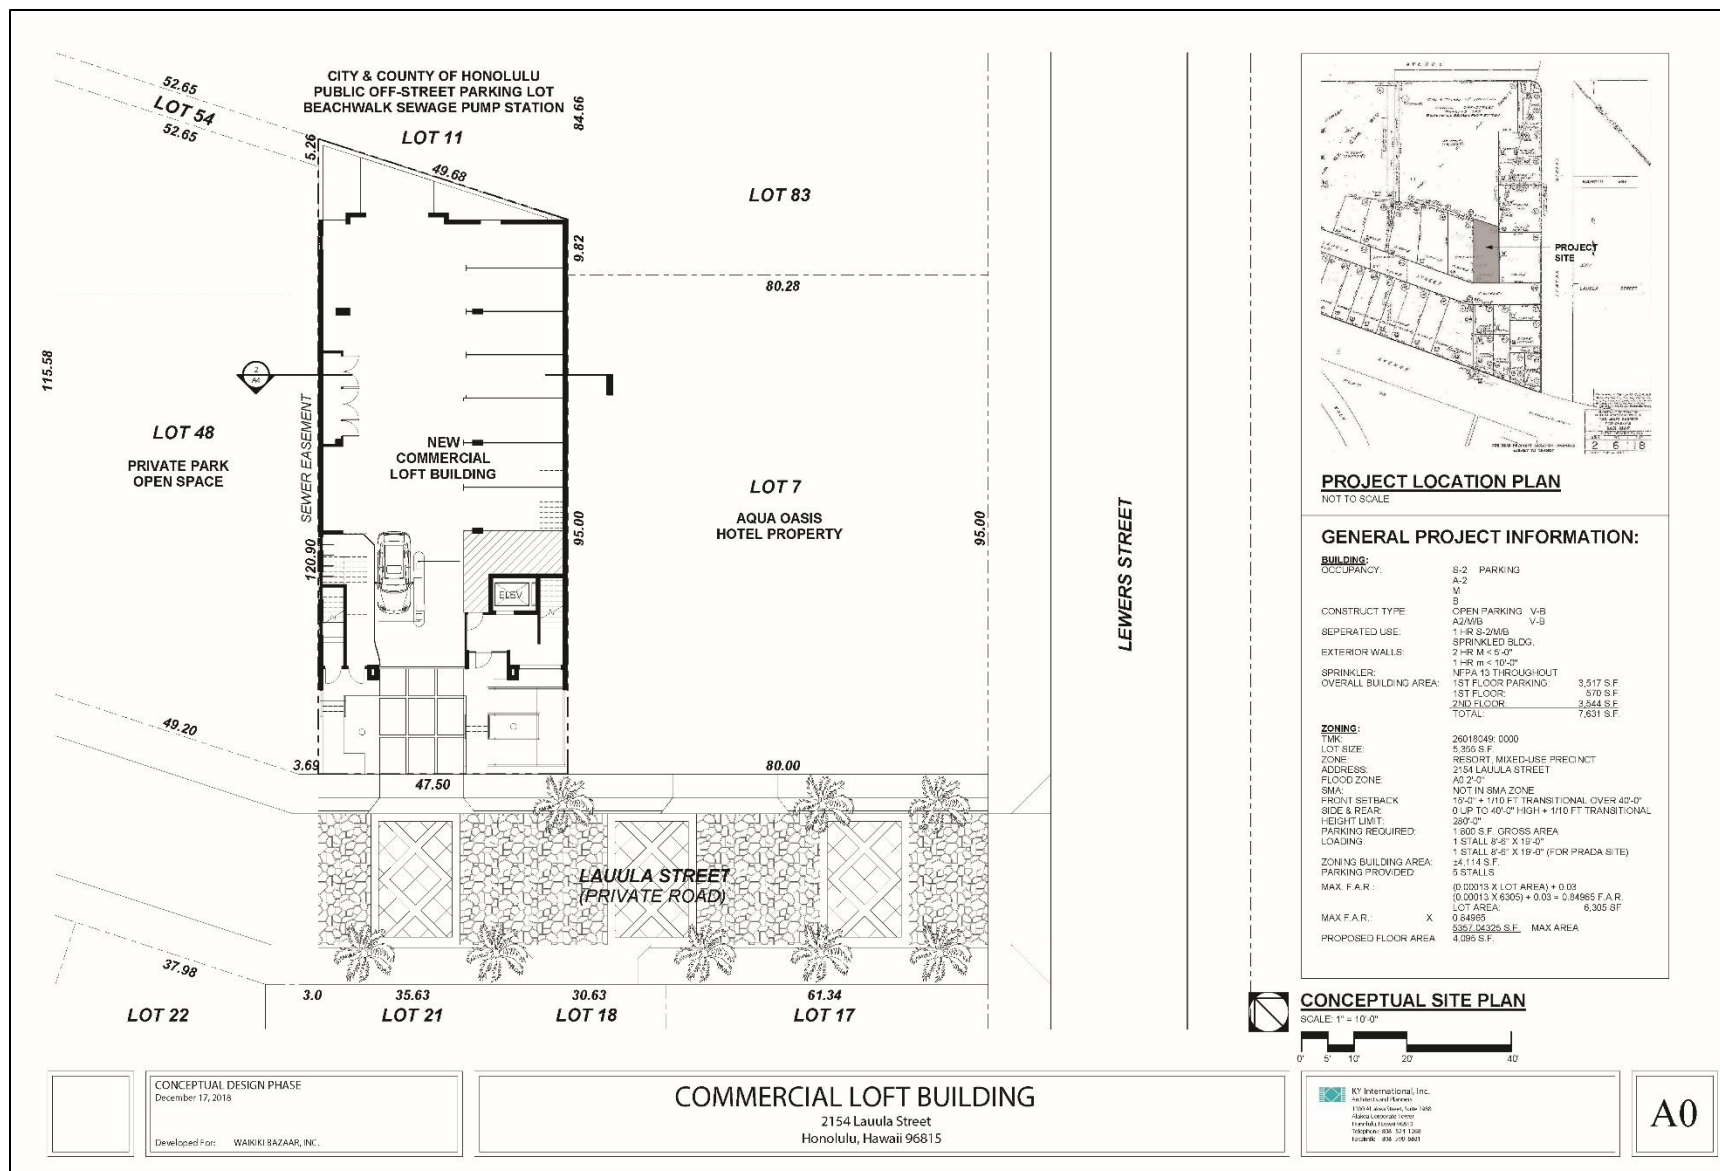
Conceptual Site Plan of the Proposed Commercial Loft Building (provided by client)
